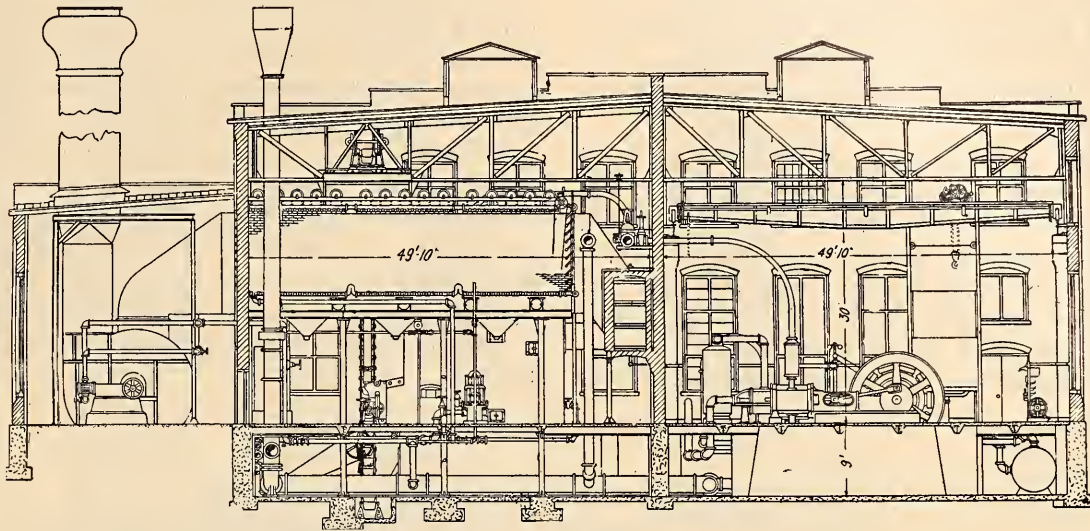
POWER HOUSE CROSS SECTION—NEW SHOPS OF THE ROCK ISLAND SYSTEM AT EAST MOLINE, ILL.
